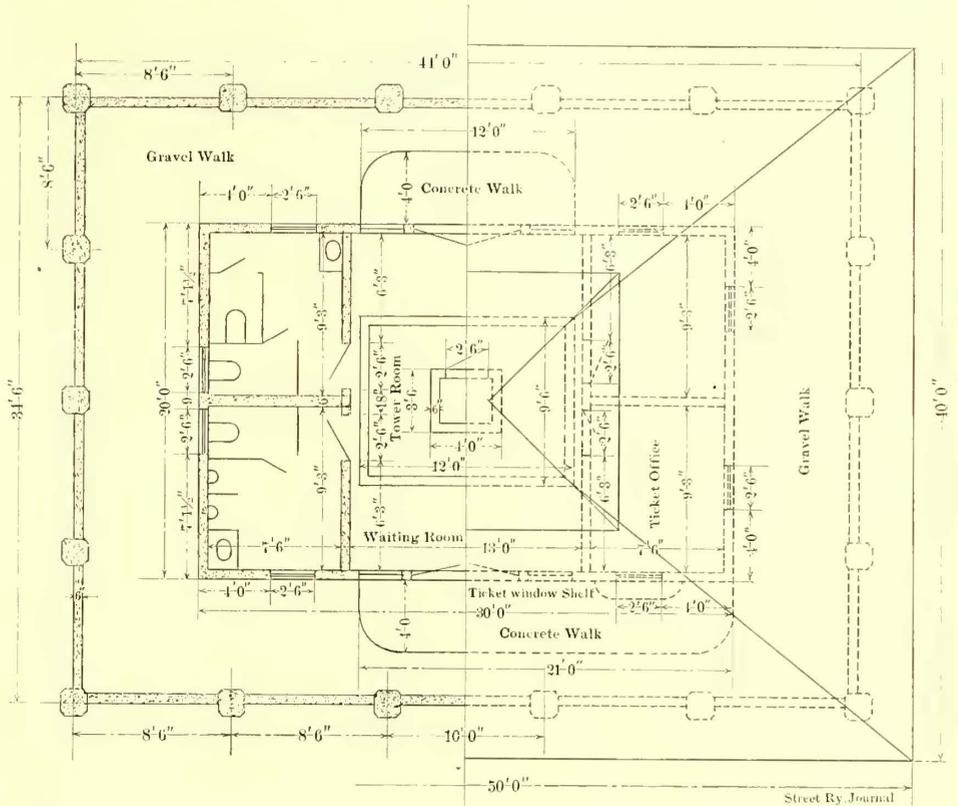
PLAN OF COMBINATION WAITING AND SUB-STATION BUILDING
